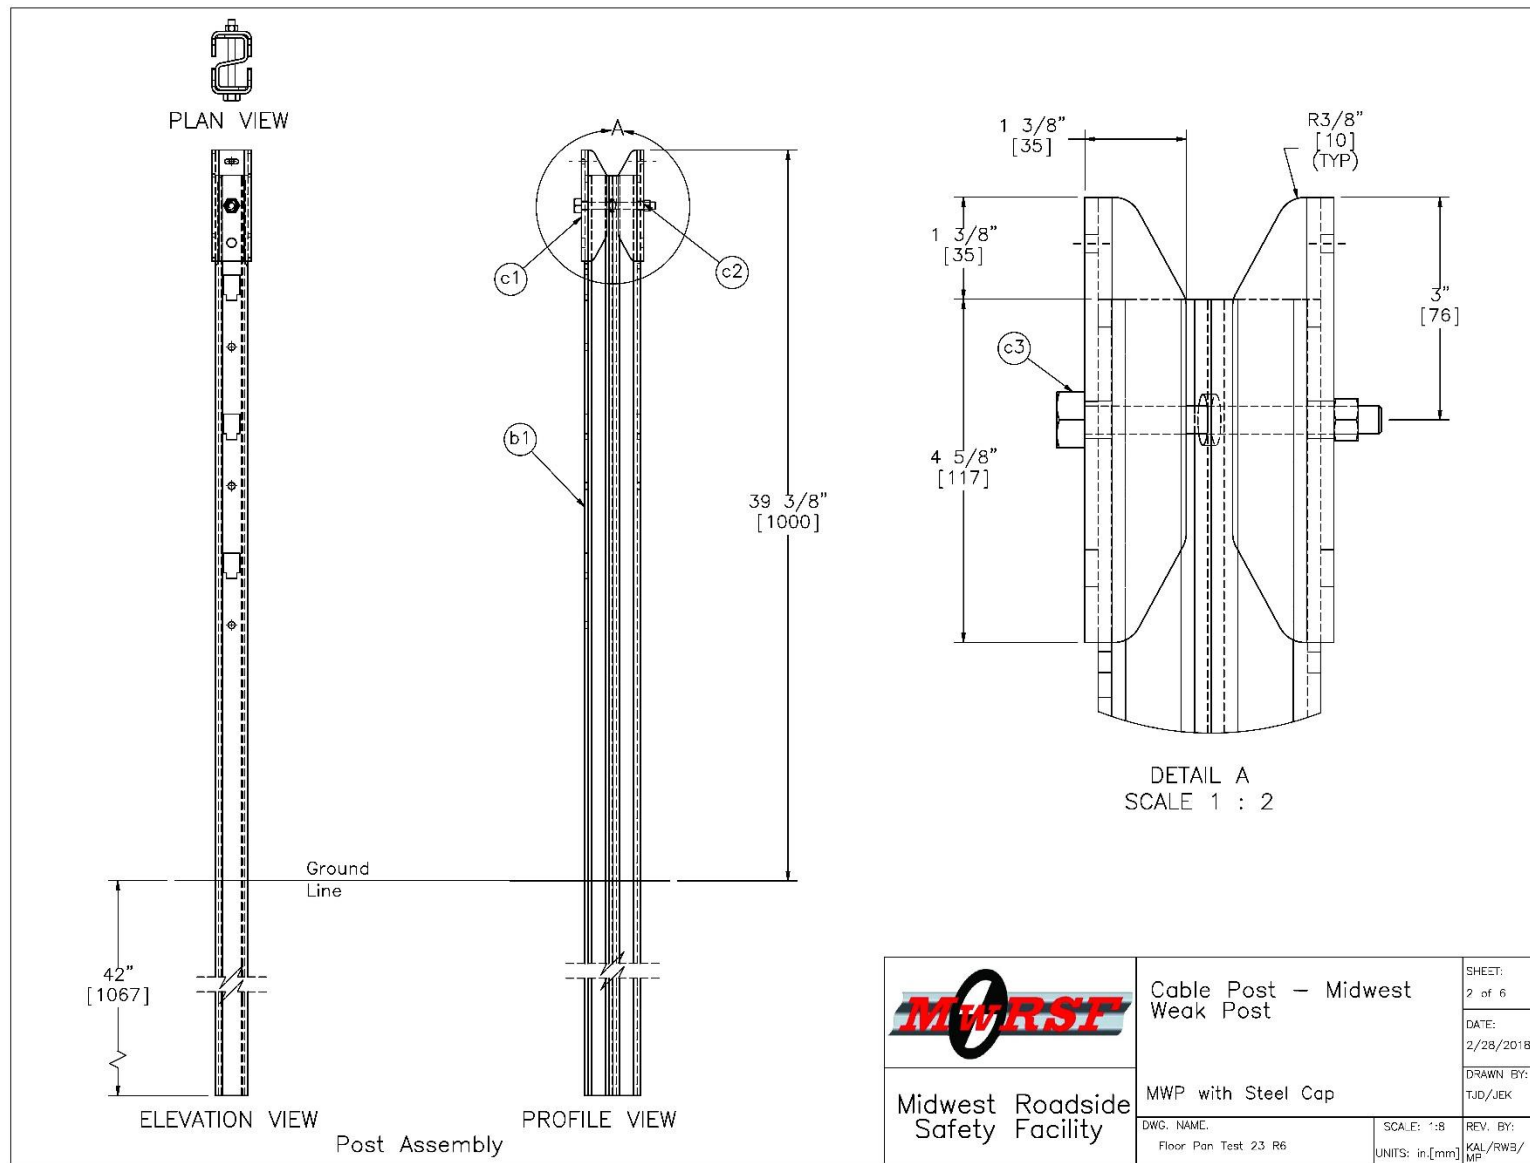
MWP with Steel Cap, Test No. MWFP-23
